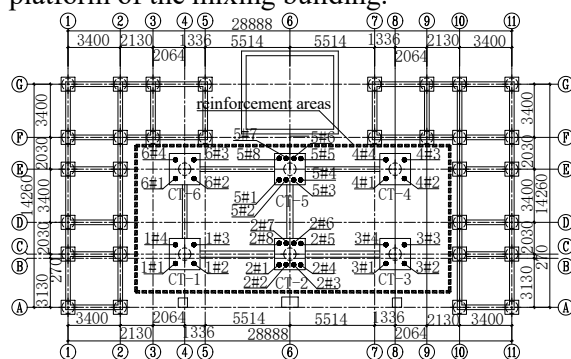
Layout of Stop Tilting Flower Steel Pipe Pile
